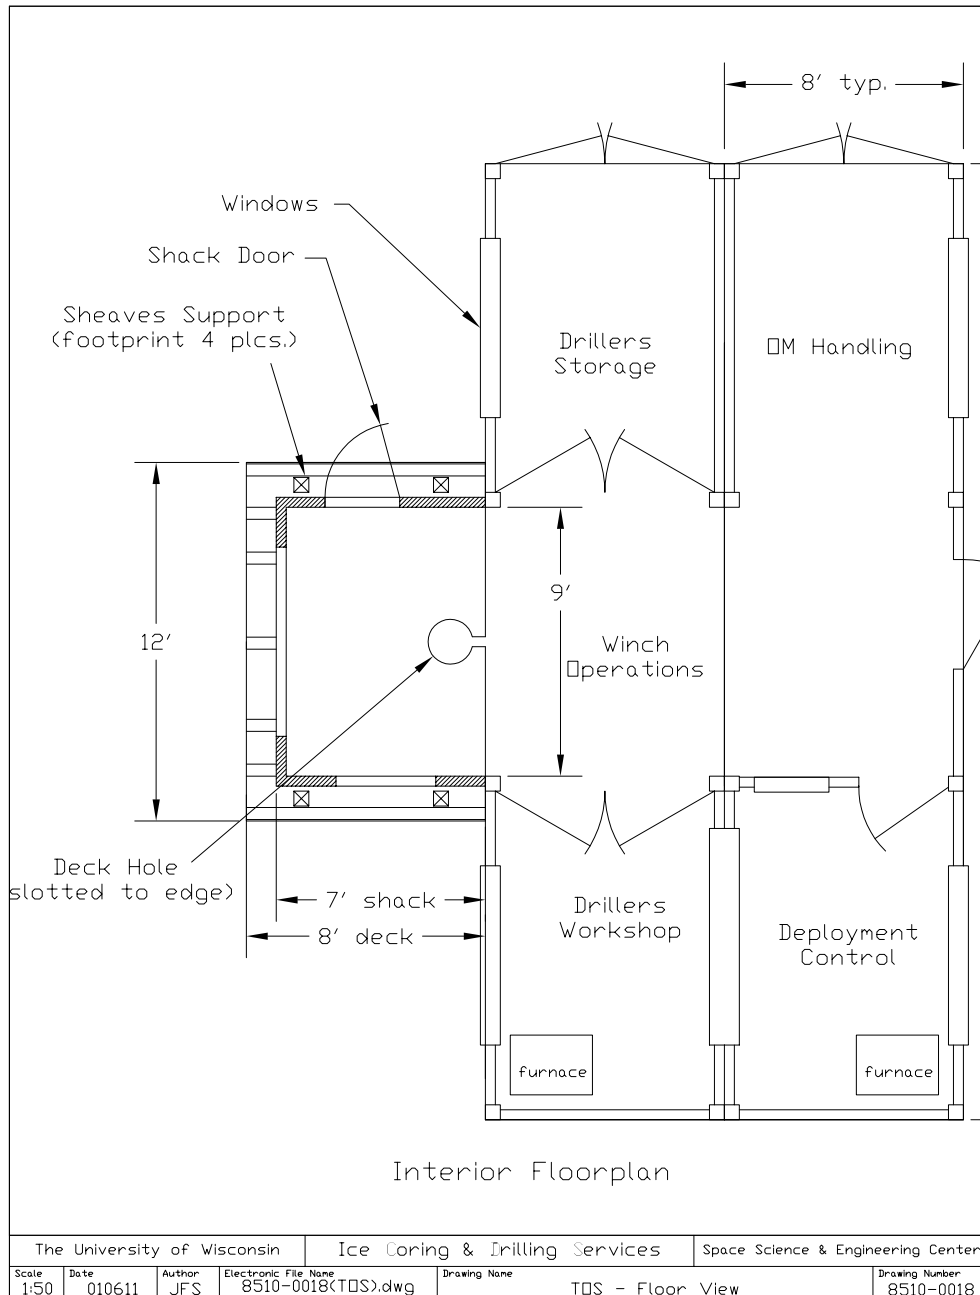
Floor plan of the tower operations structure (TOS). The building is used for drilling and deployment. The heated building provides power and network access.
